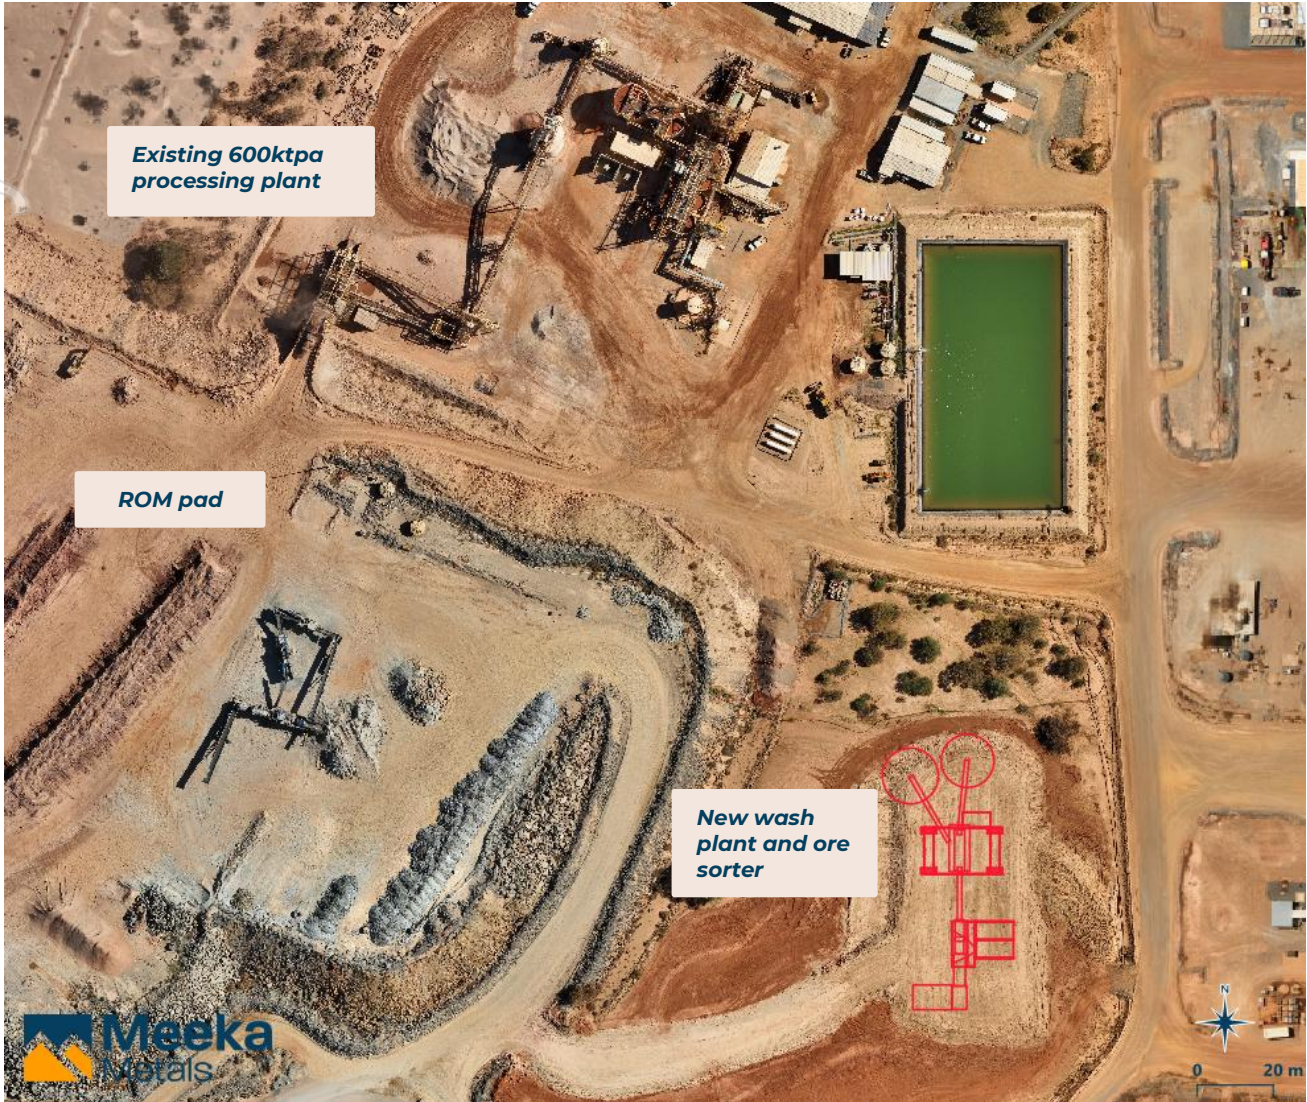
Plan showing new wash plant and ore sorting facility, and existing processing infrastructure.
